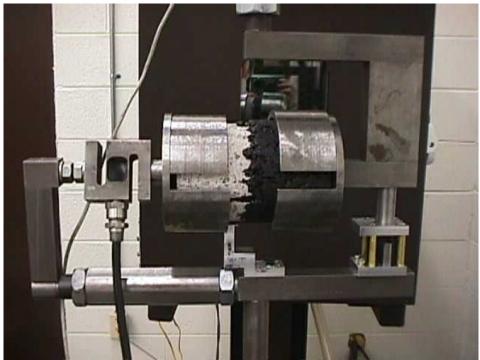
Front View of the Fixture Containing Bridge Deck Control Specimen.
